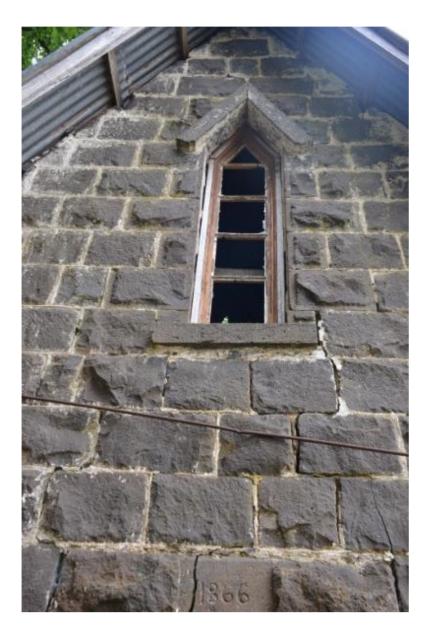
Detail of highlight window and stepped cracking on front of Bath House. View North. Photo A. Wilkinson
